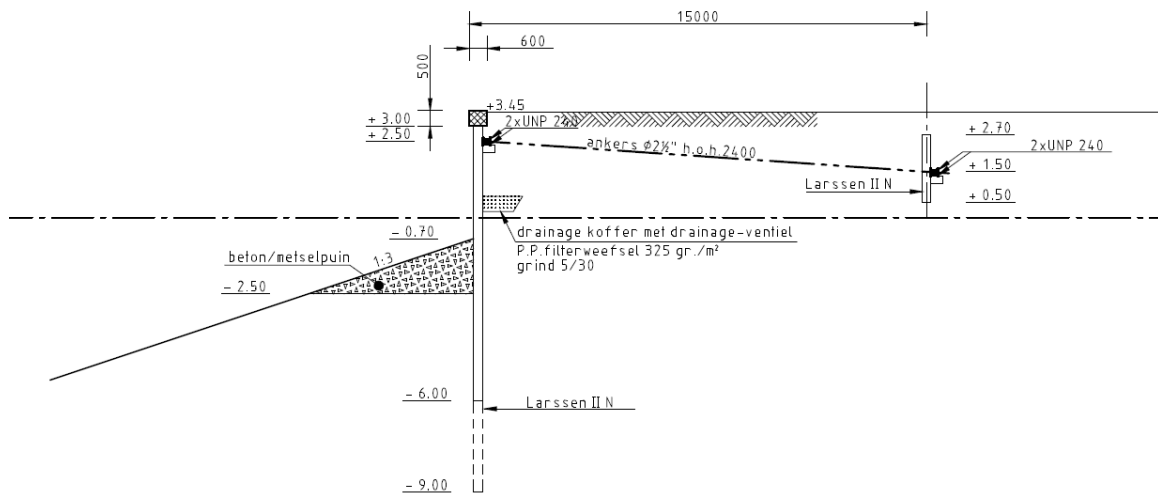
Cross-section of the sheet pile wall at the riverside of Pier 1 (Port of Rotterdam)
